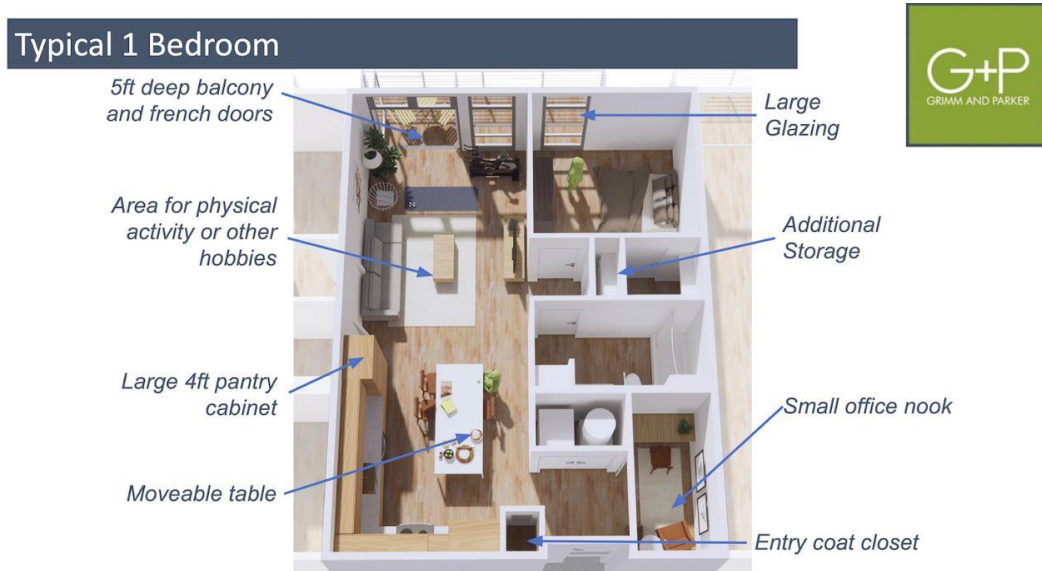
Typical layout of a 1-room apartment – plan by Grimm+Parker, 2021
